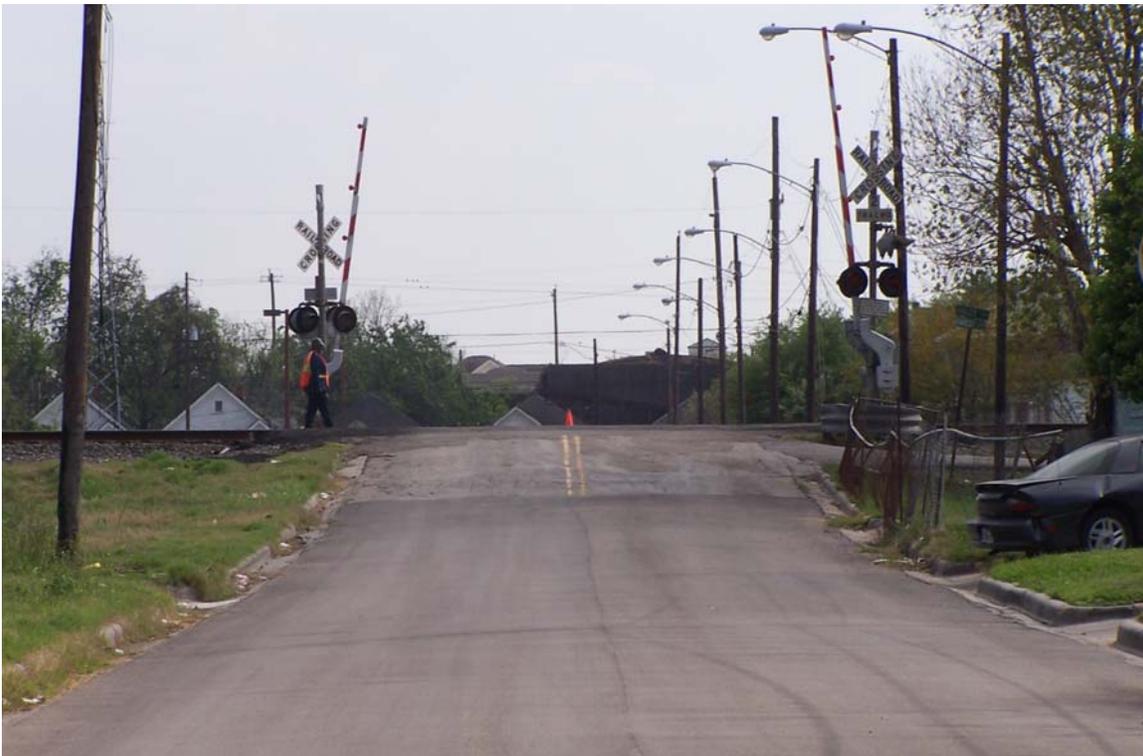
Terminal Subdivision at Hailey St (looking south)
